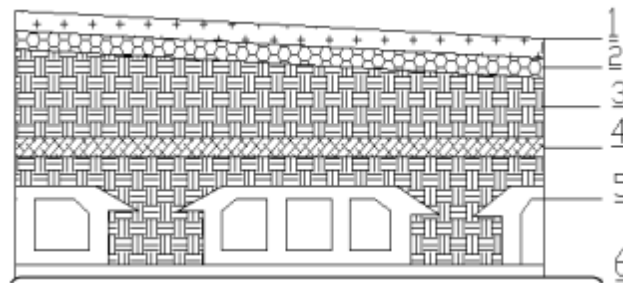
Detail of an inaccessible terrace floor (DTR C3-4)
